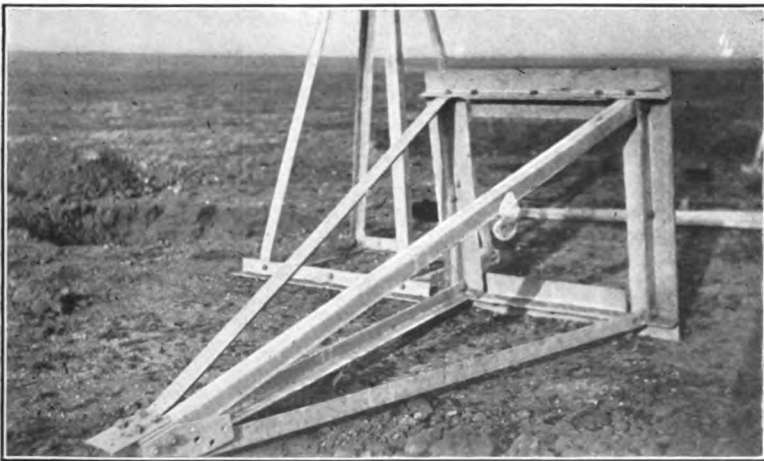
ANGLE TOWER, SHOWING BRACKET TO PREVENT LOOP FROM
